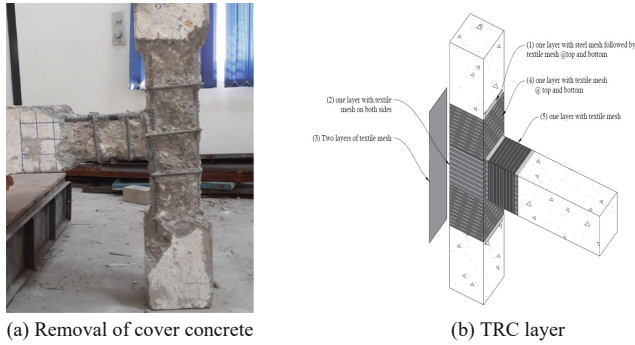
Retrofitting techniques used in beam-column joint specimens after cyclic test.
